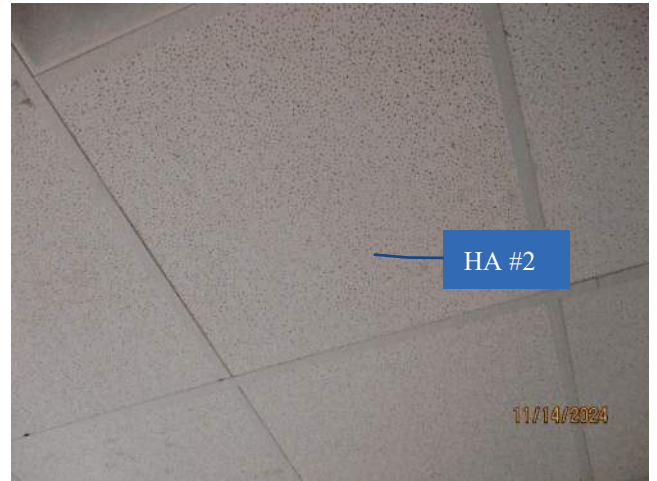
View of HA #2: Non-ACBM 2' x 2' lay-in ceiling panel (chicken scratch).
